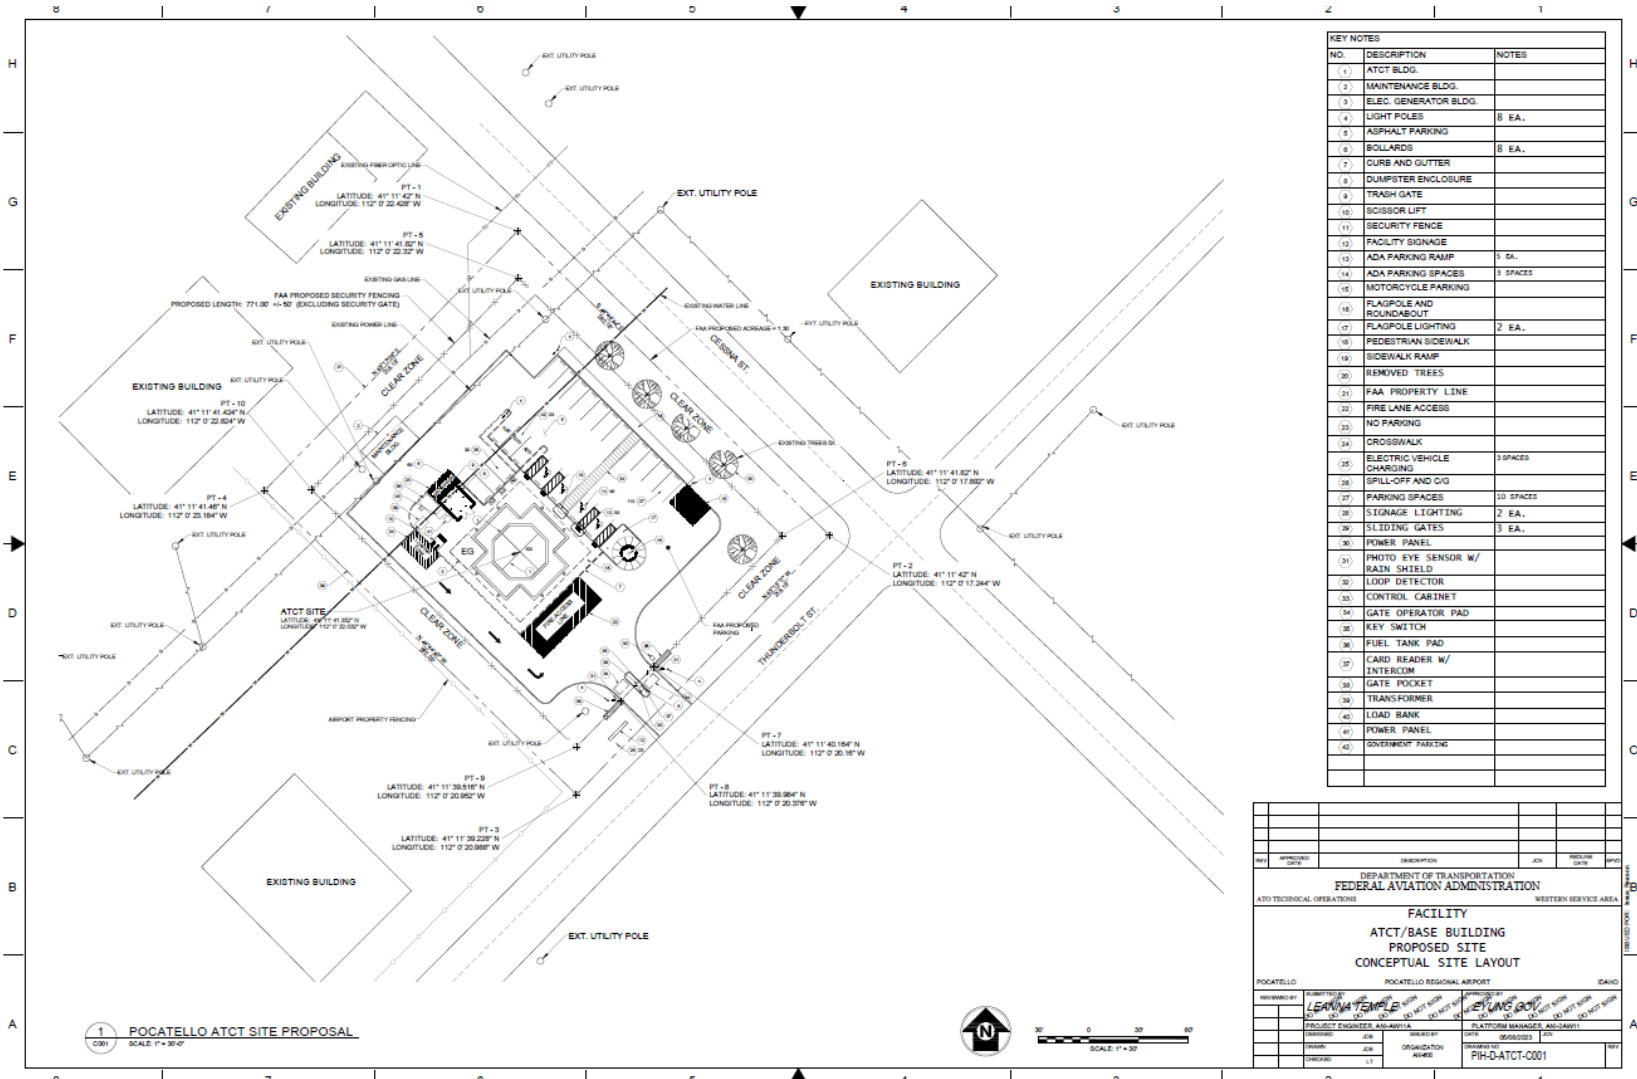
Proposed Layout of Replacement Tower Facility Site
